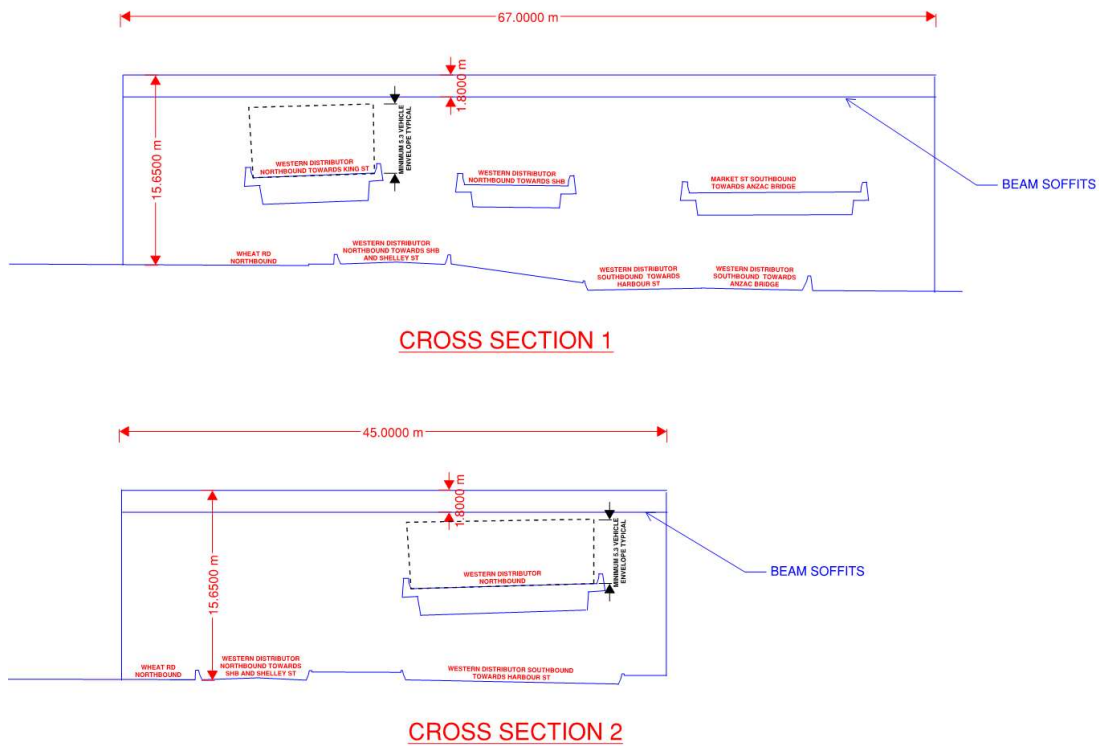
Indicative cross sections of roadways beneath the proposed land bridge (dimensions are approximate only)
